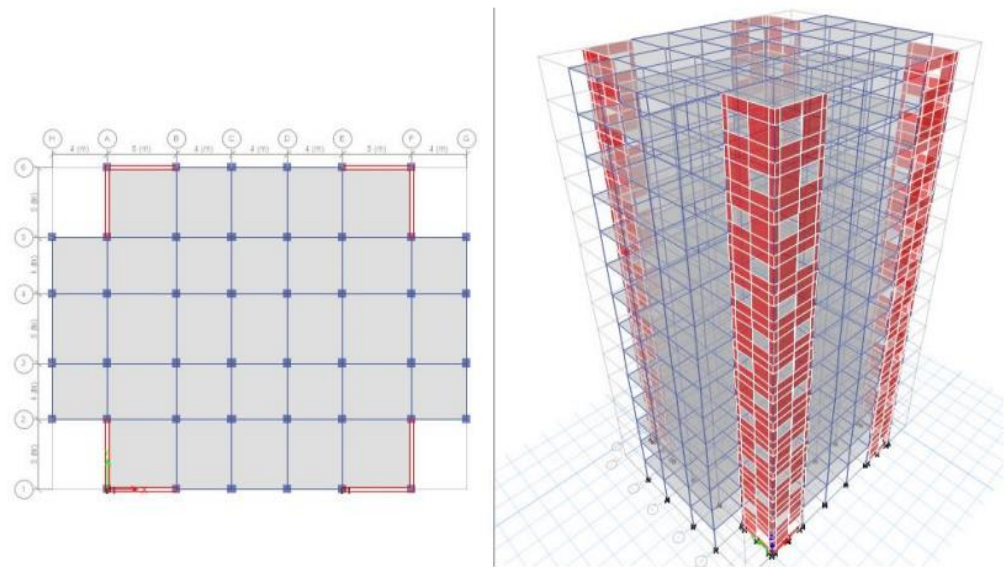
The geometry of the structure and 3D structure shear wall without opening.
